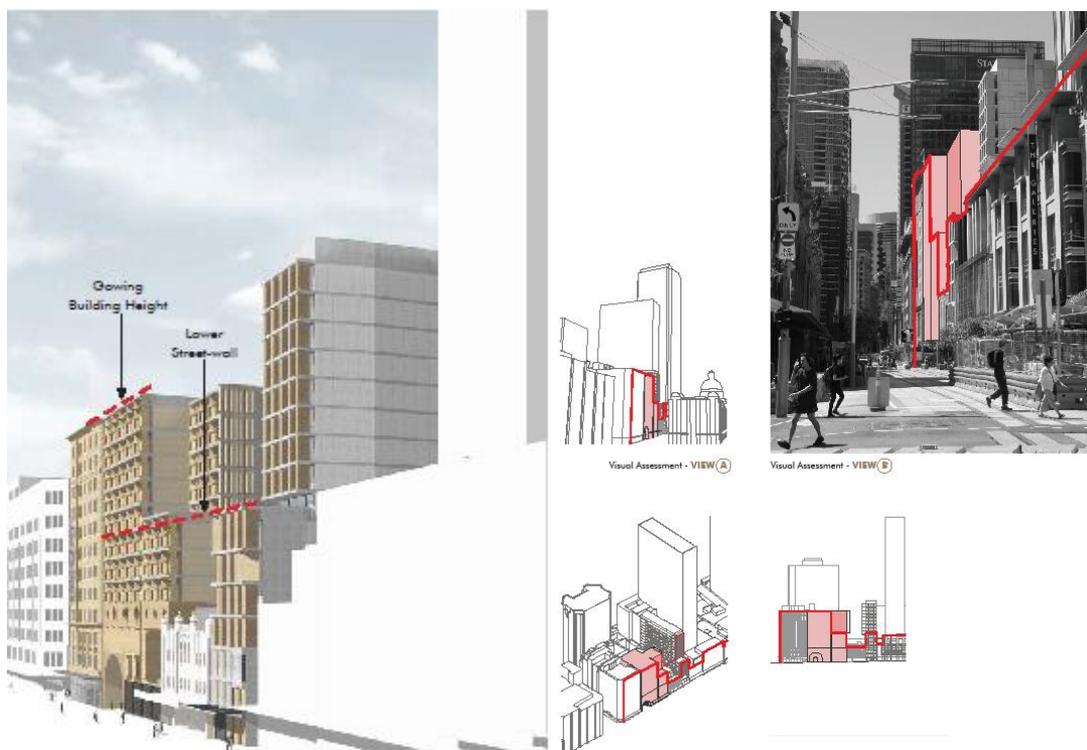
Extract from 'Facade Design Development Report (Candalepas Associates), showing an option matching the Gowings building height, street wall height and setbacks of buildings to the south
